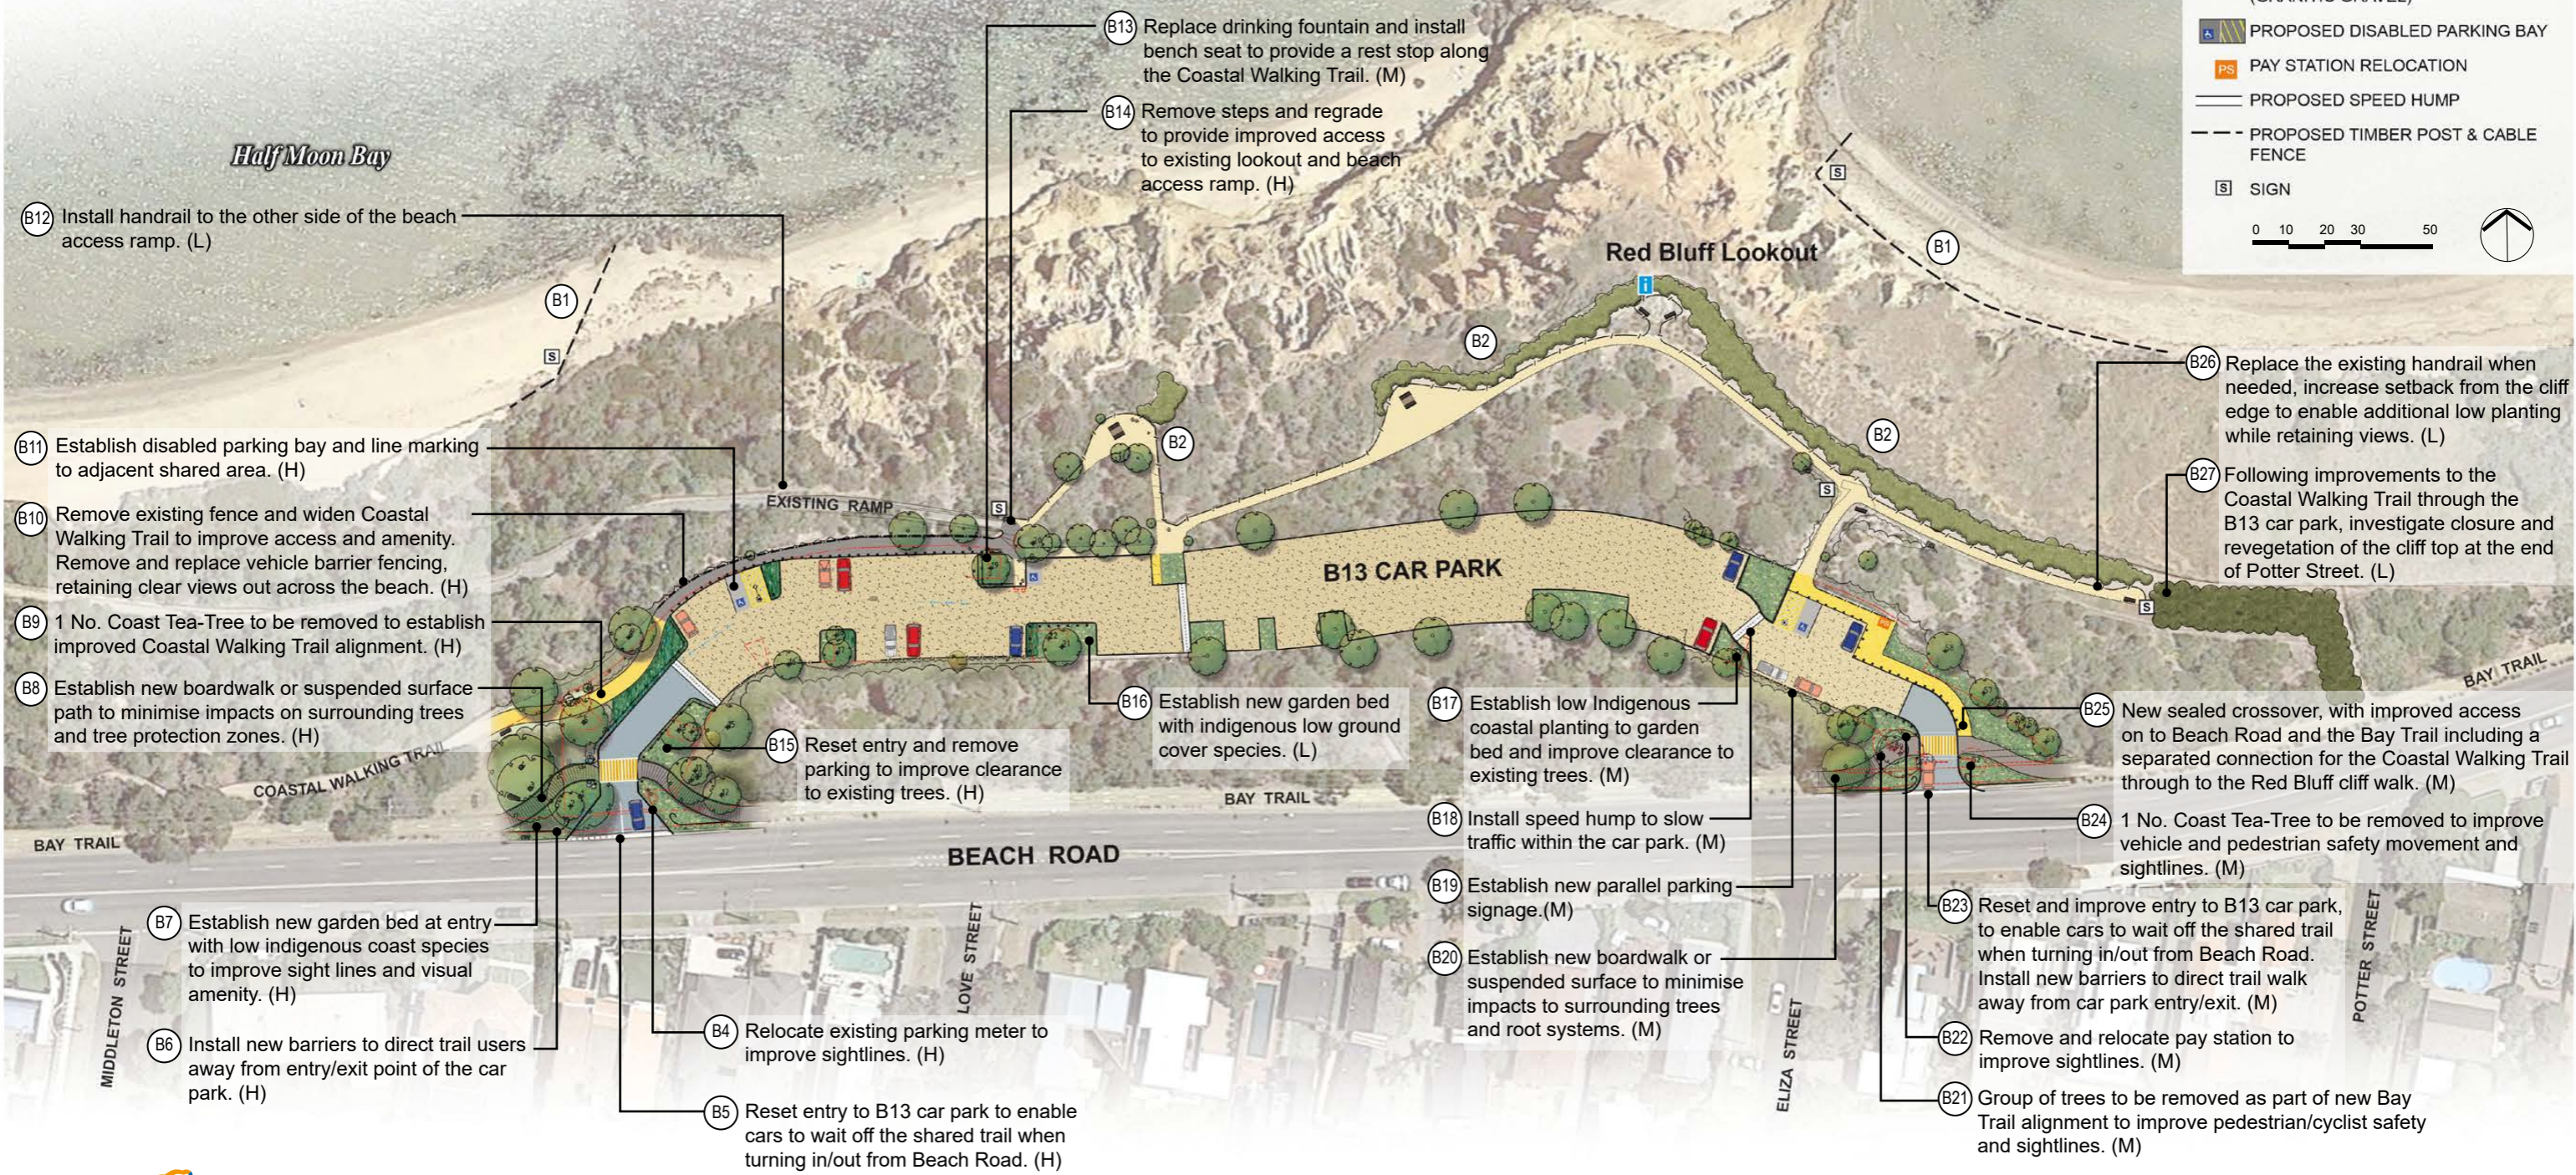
DETAIL PLAN C – RED BLUFF AND B13 LOVE STREET CAR PARK
